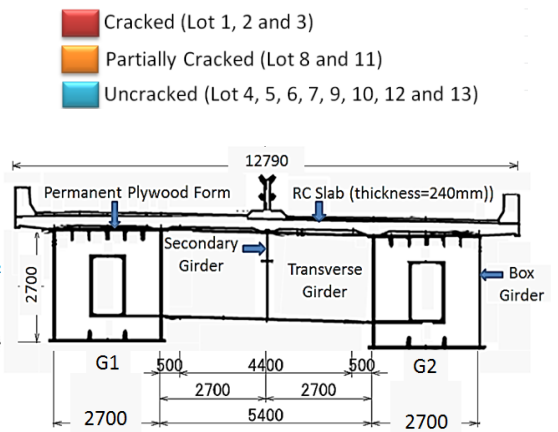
Cross section of Shinkesen Ohashi deck girder bridge
